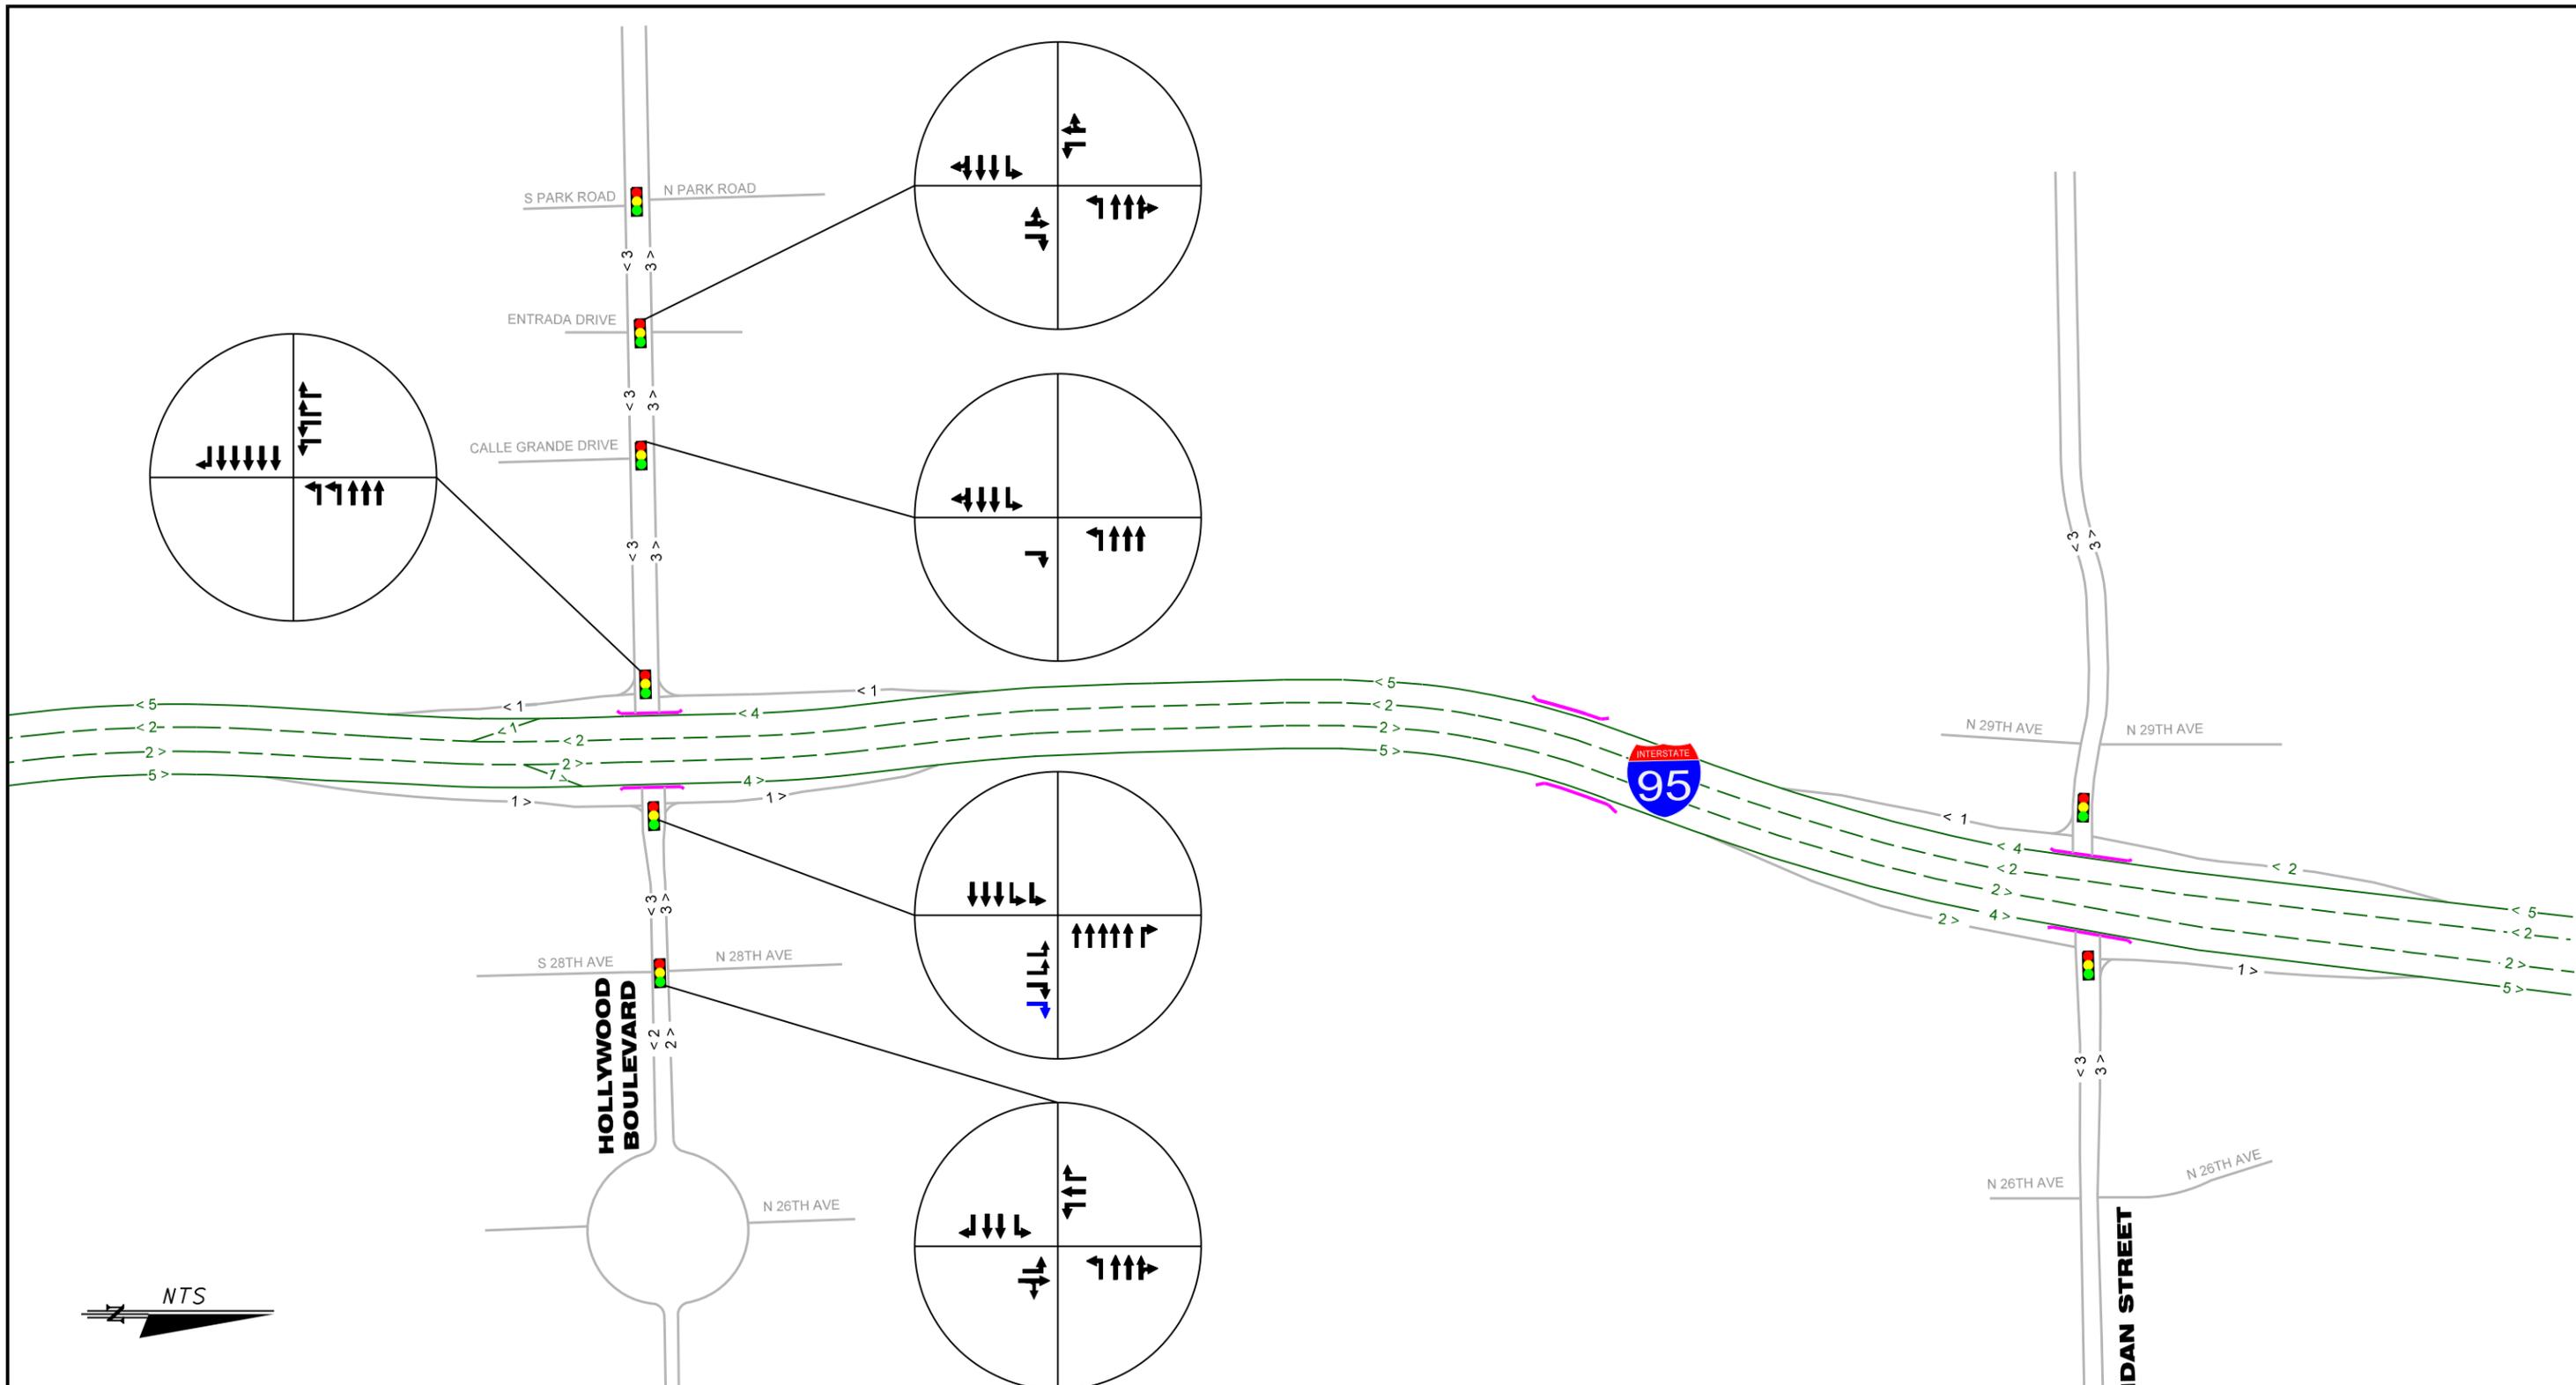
I-95 No-Build Alternative Roadway Section North of Pembroke Road
